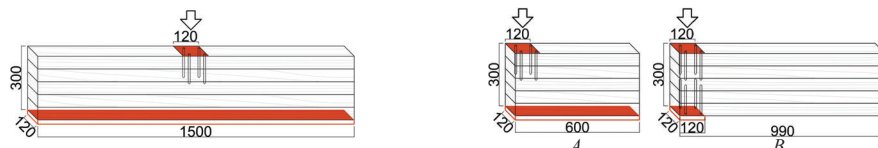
Specimens for central column-beam joints (left) and corner column-beam joints with load case A or B (right)
